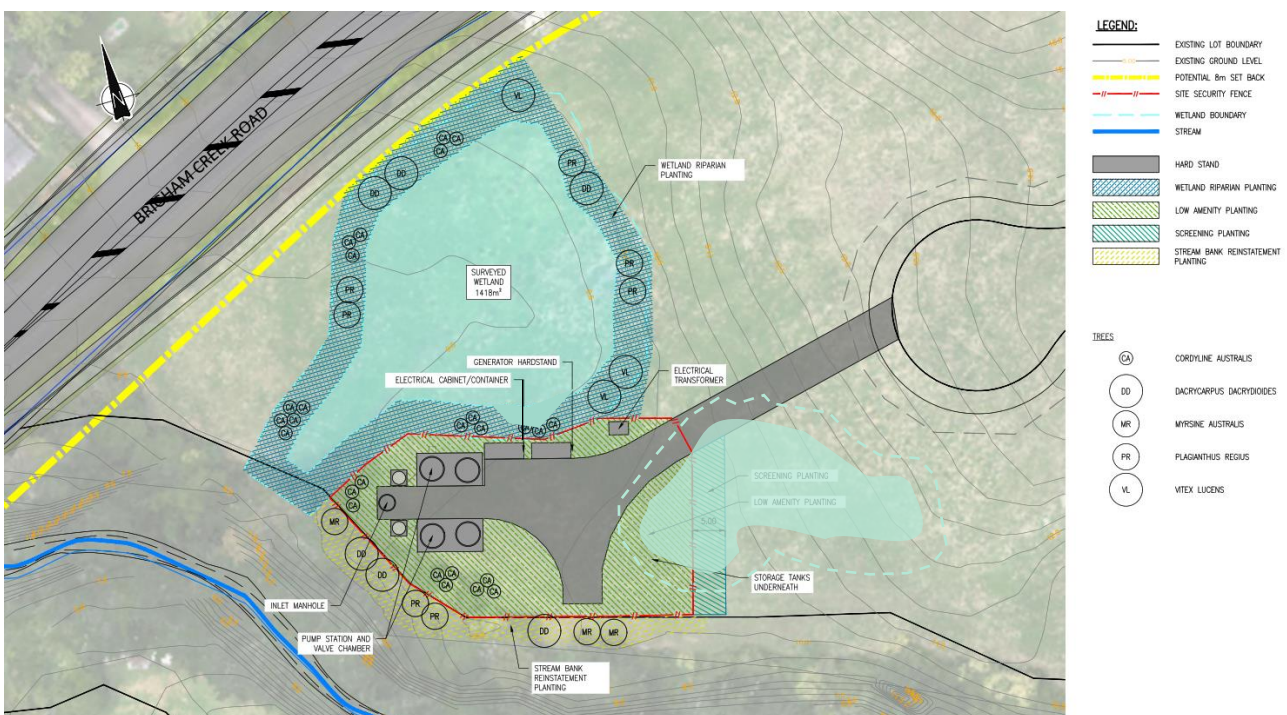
Pump station preliminary landscape plan (Source: Drawing 2013646.001, WSP GHD, provided in Appendix A)
